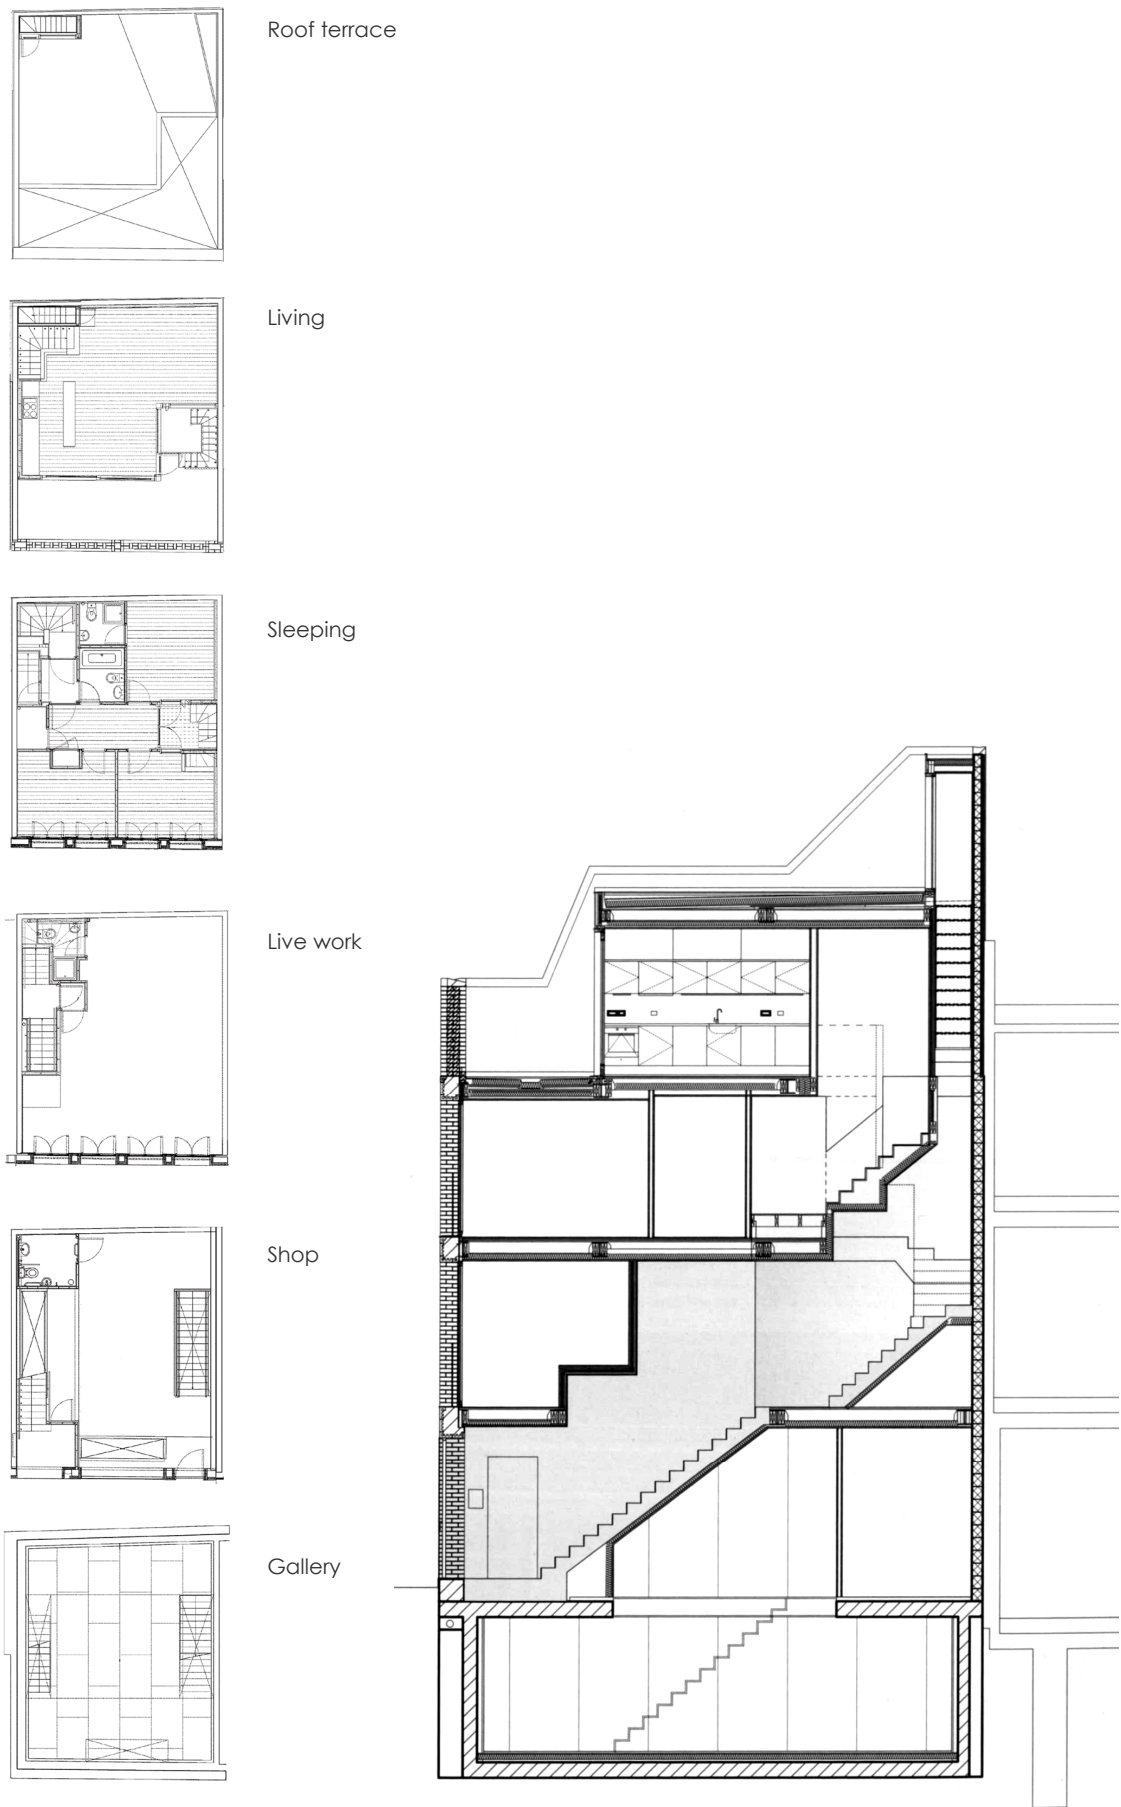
Floor plans; Fig. 5.34 Section through House on Work
